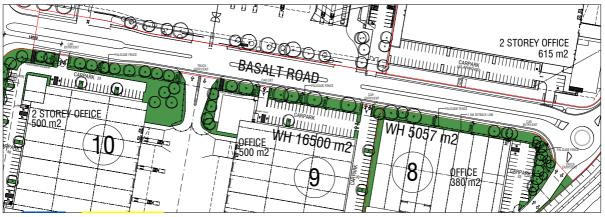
Basalt Road - As Amended (Source: Plan MP.08.2 Rev. H)
